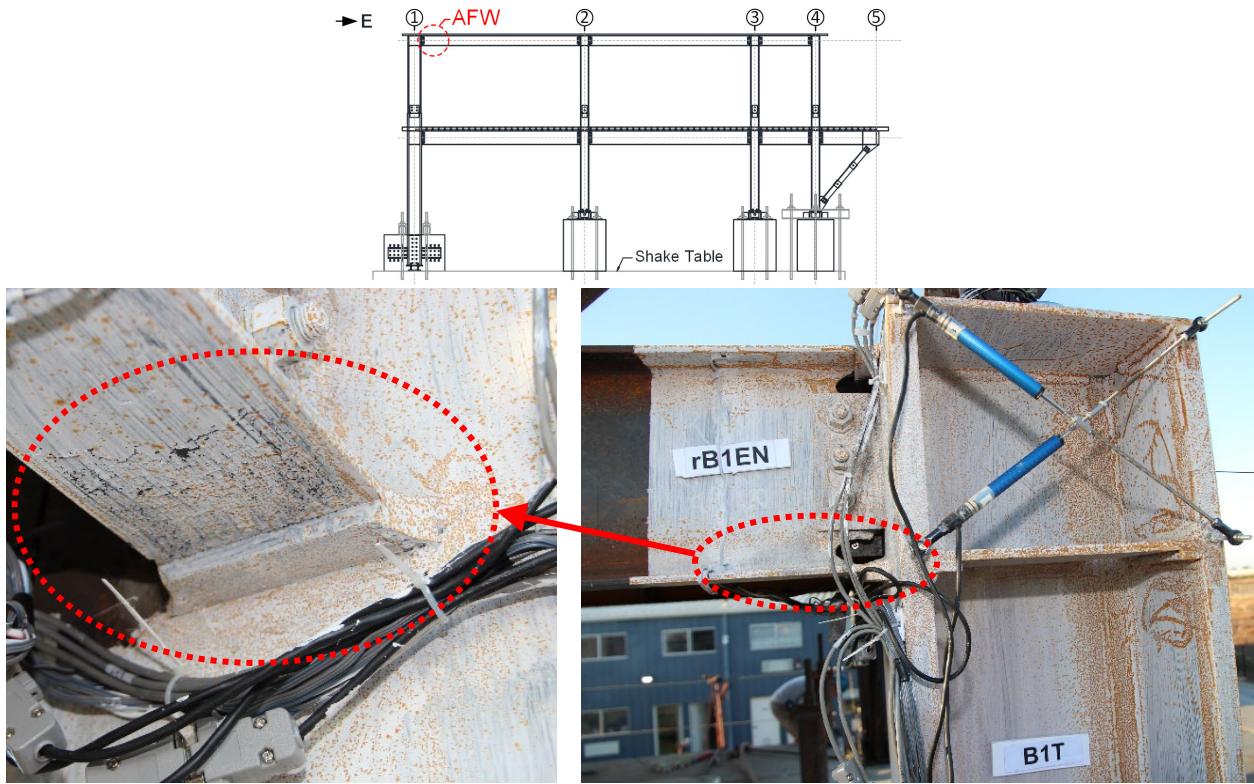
After Test 2B-5: Mild Yielding of Bottom Flange at Roof AFW Connections
